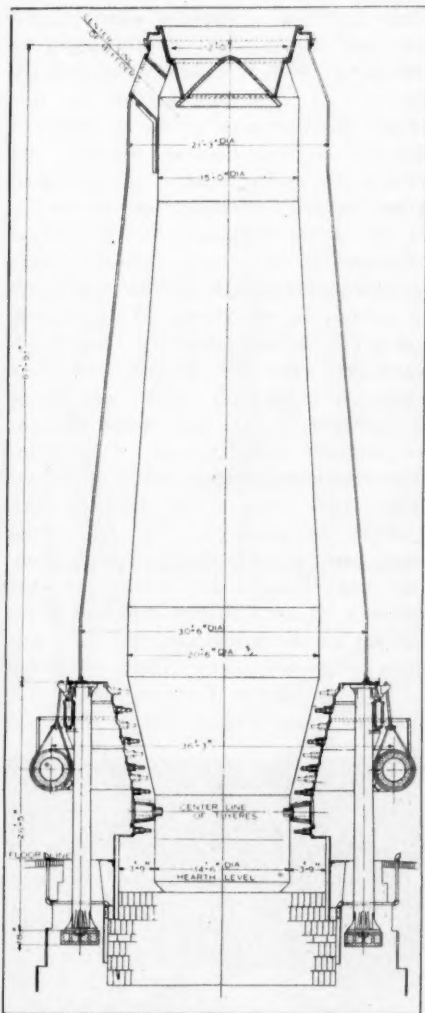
SECTIONAL VIEW OF THE NEW BLAST FURNACE
